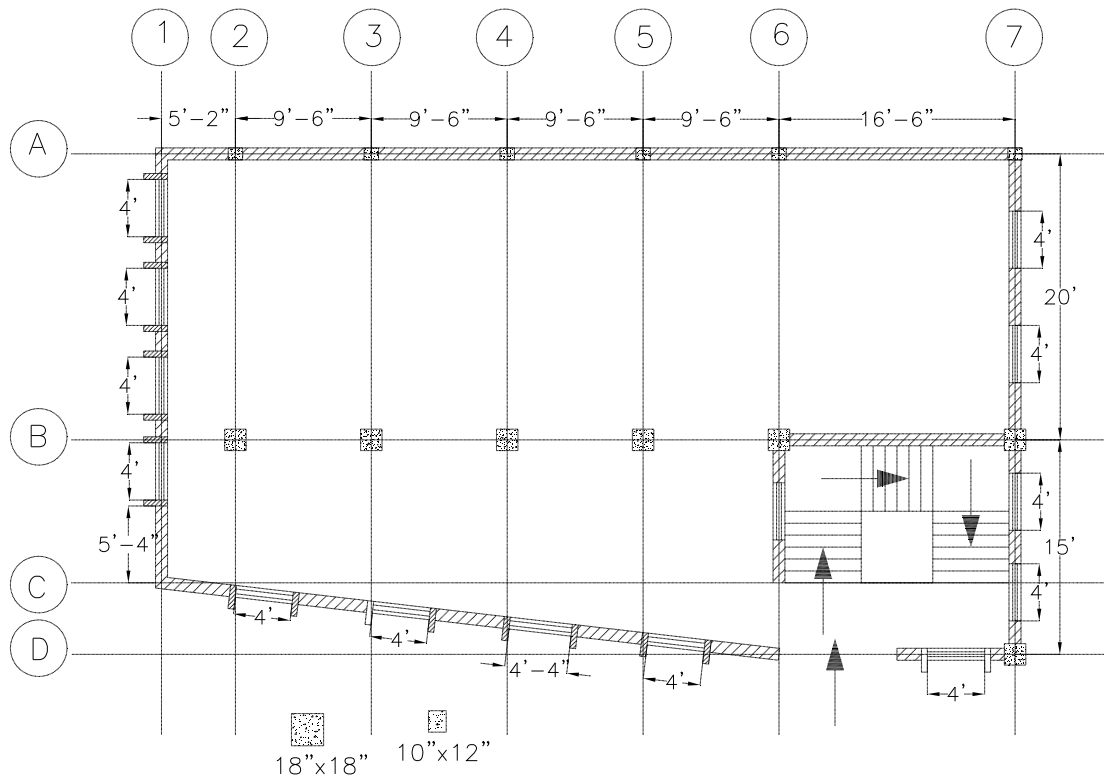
Building Plan of Bangshal RokonUddin Jame Mosque
